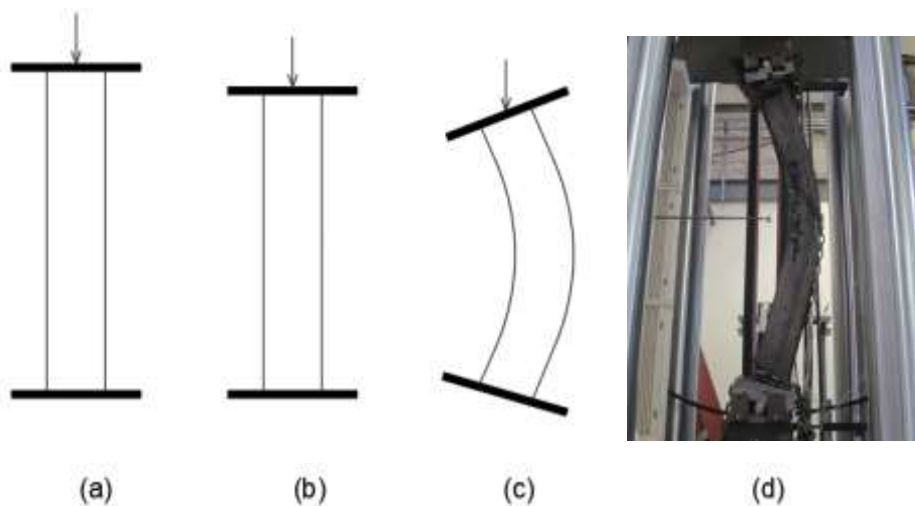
Buckling failure of a column. (a) before the loading, (b) during the loading, (c) failure, (d) illustrative photo from the web [16].
